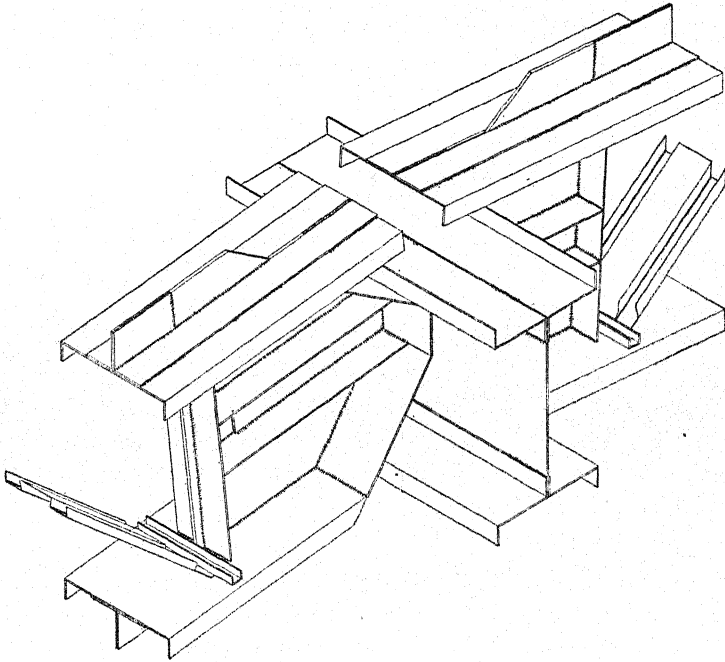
Isometric view of top articulation and centre longitudinal beam.
